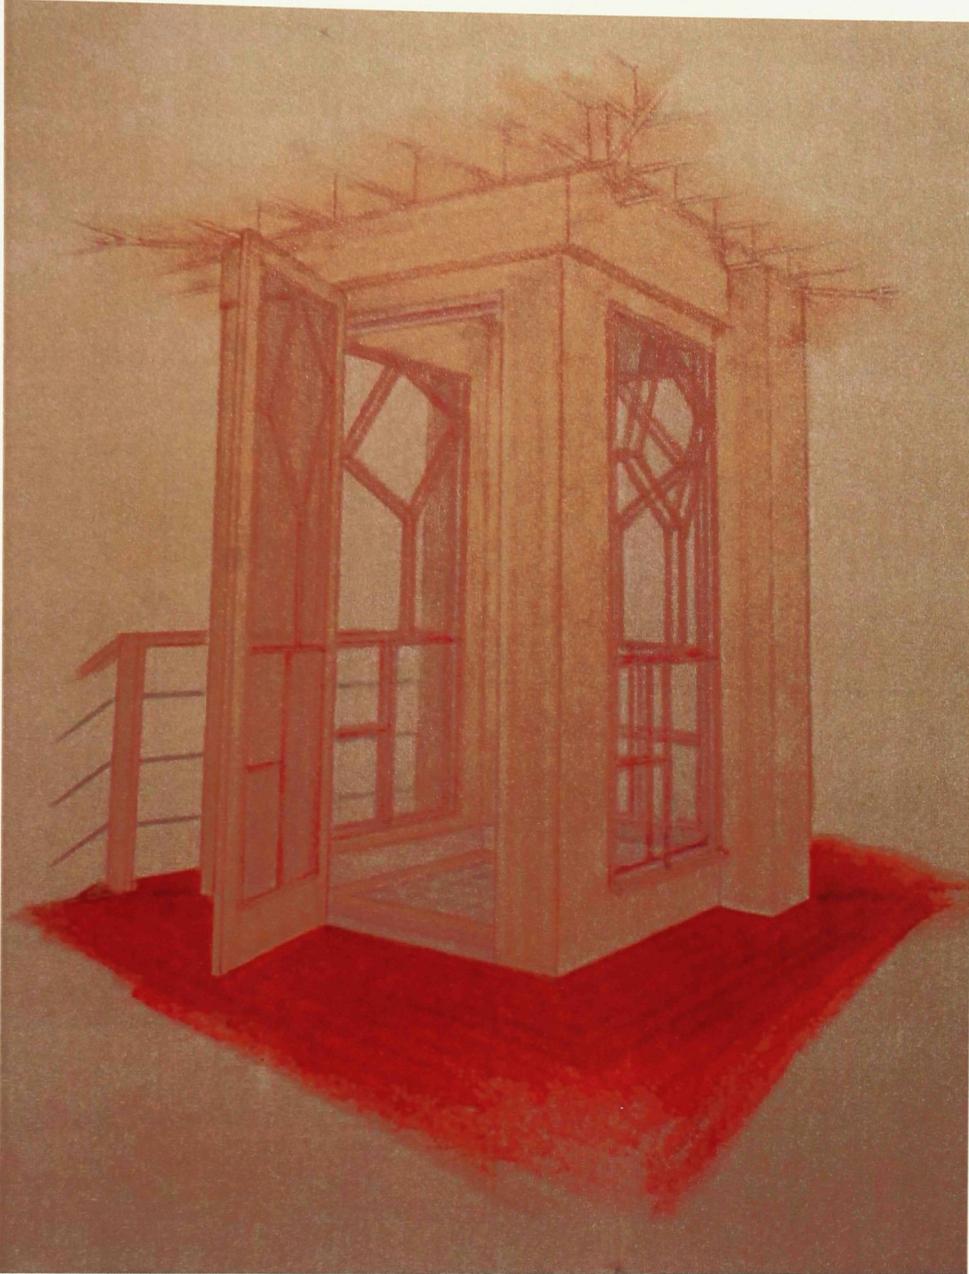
Elevator for Phase IV Long Term Care Plans (in existing light well)
